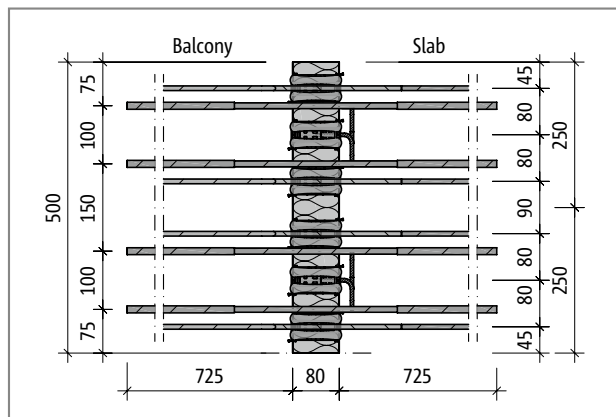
Schöck Isokorb® T type K-E-M6: Product layout of the variant length L500
